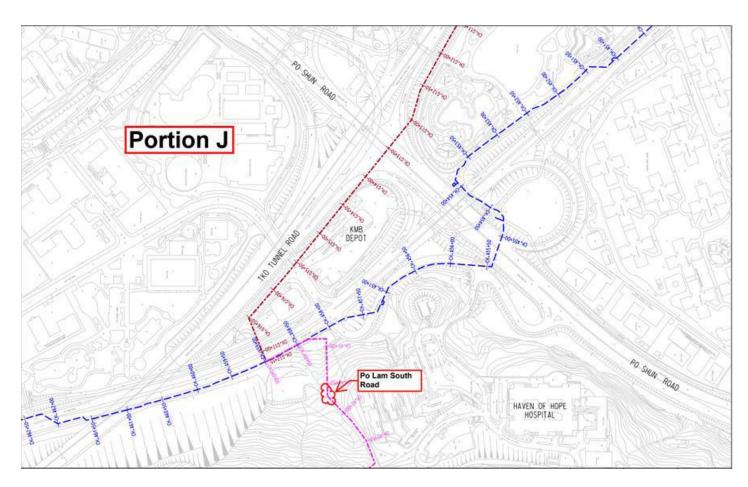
Location Plan for Portion J - Mau Wu Tsai 1 (Po Lam South Road 1)
